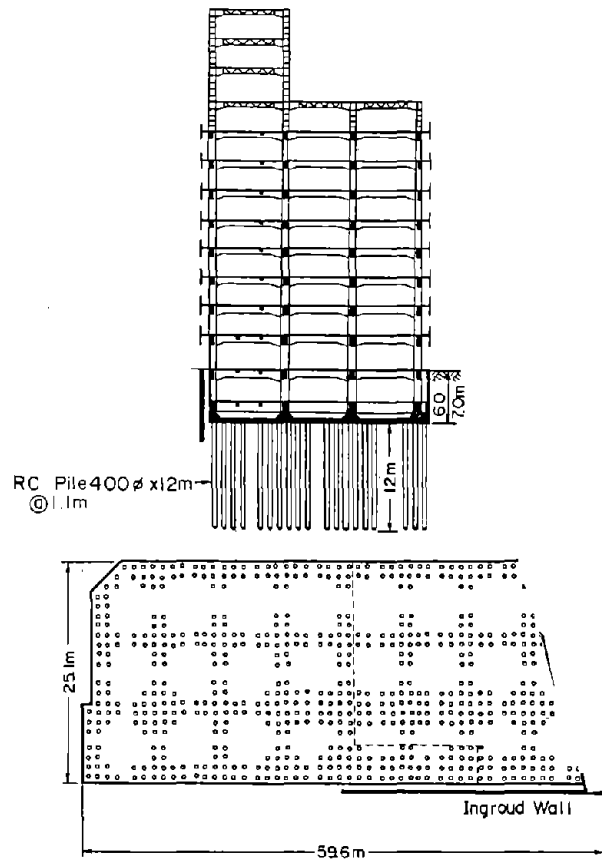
Outline of the Hokuriku Building and Arrangement of Foundation Piles (Y.Yoshimi¹⁵)
